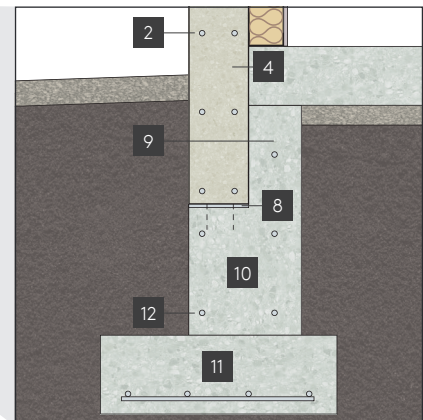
Structural bay and foundation detail of the building using tilt-up concrete.
